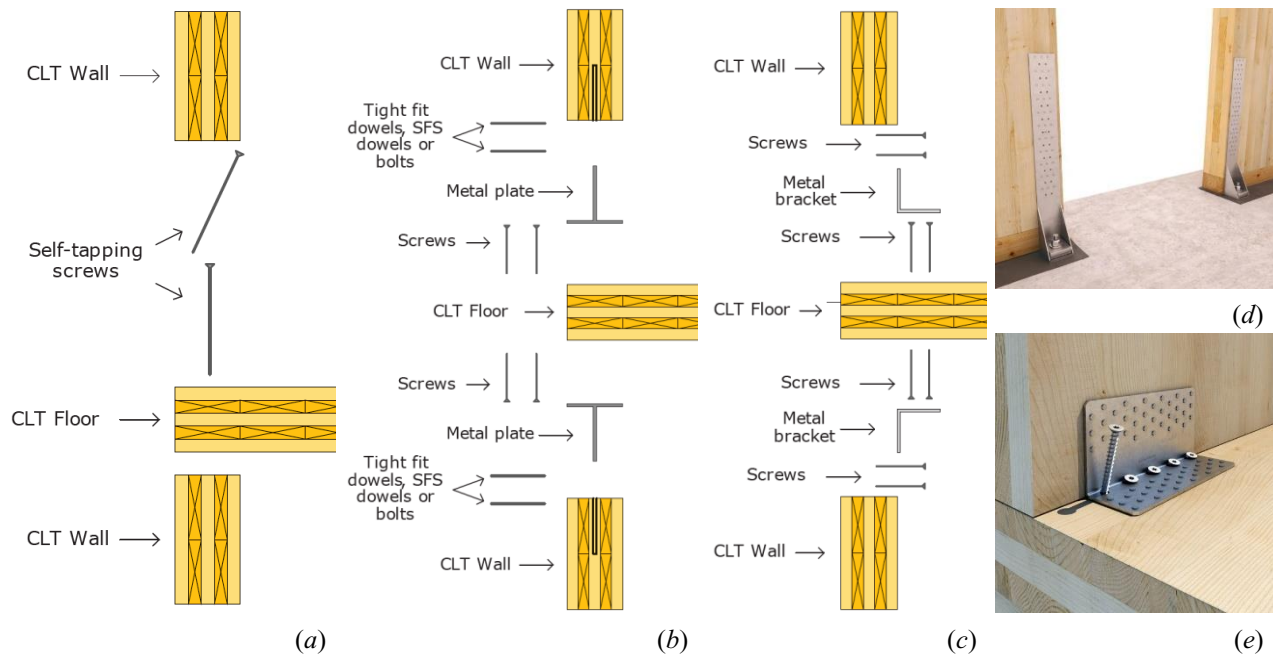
Wall-to-floor connections for platform CLT constructions: (a) self-tapping screws, (b) concealed metal plates, (c) metal brackets, (d) hold-down and (e) angle bracket (images credits: (a-c) CLT Handbook [39], (d) Progetto Energia Zero [84] and (e) Timber-Online [85]).
